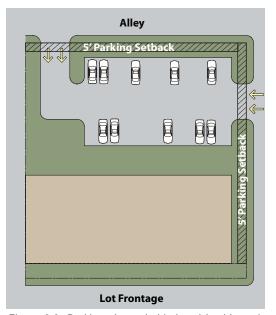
Parking shown behind and beside main building. Parking setbacks are shown hatched.
